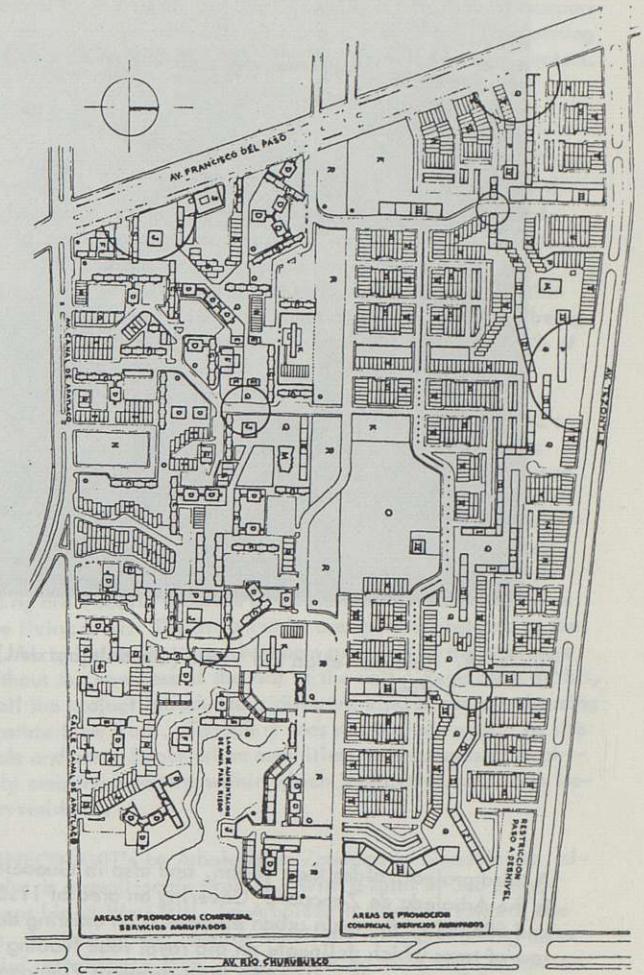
Unidad Iztacalco (Mexico DF): Site Plan
